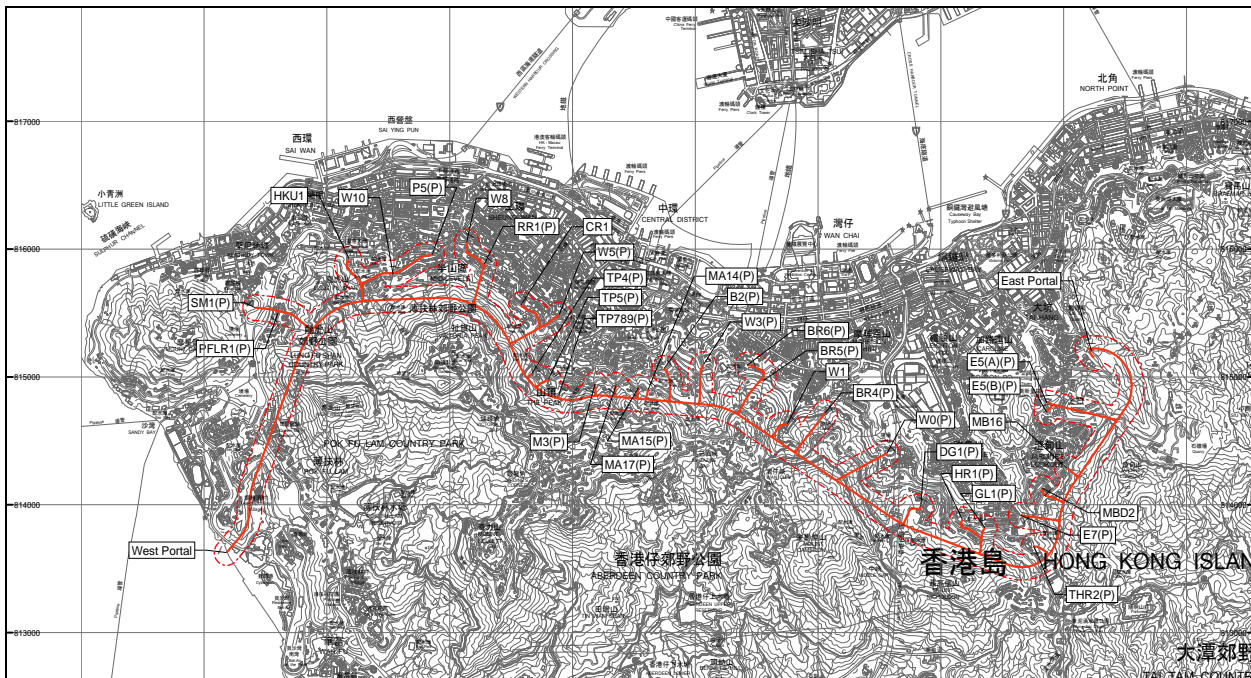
Layout of Hong Kong West Drainage Tunnel, Shafts and Adits
